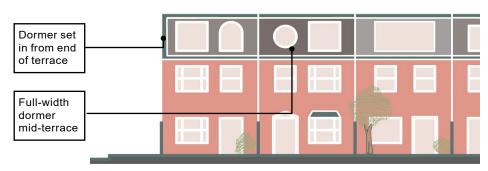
Dormers on a terraced houses that are full-width for midterrace houses, but set in from the edge of a gable end (or hipped roof) on the end of terrace house.
